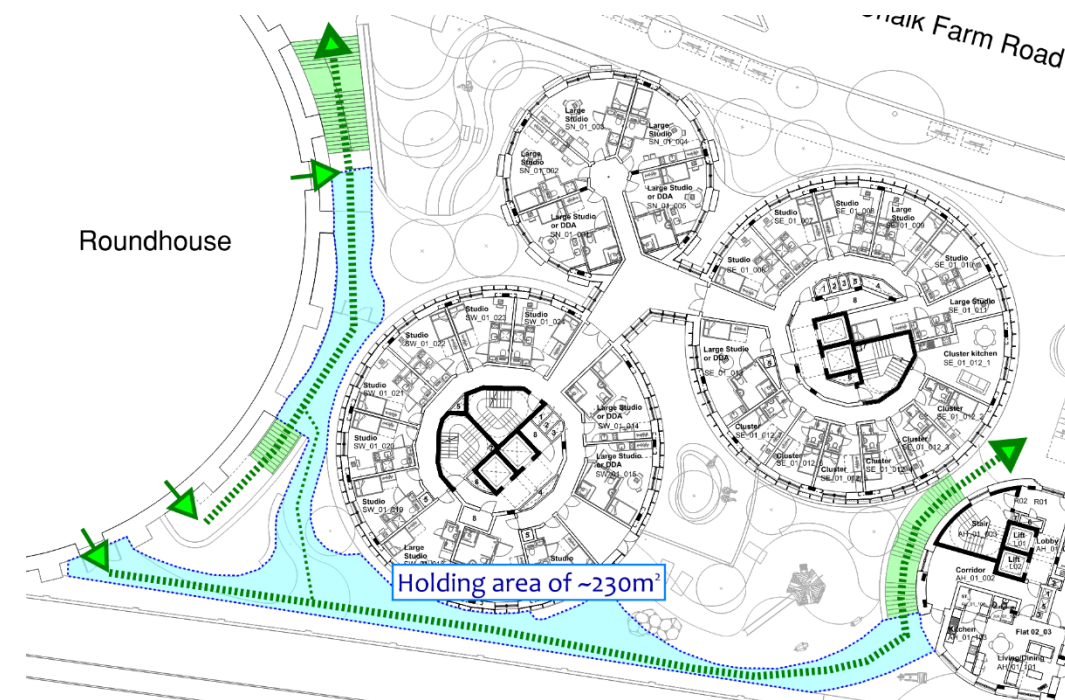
Escape from the Roundhouse across the external terrace at First floor
